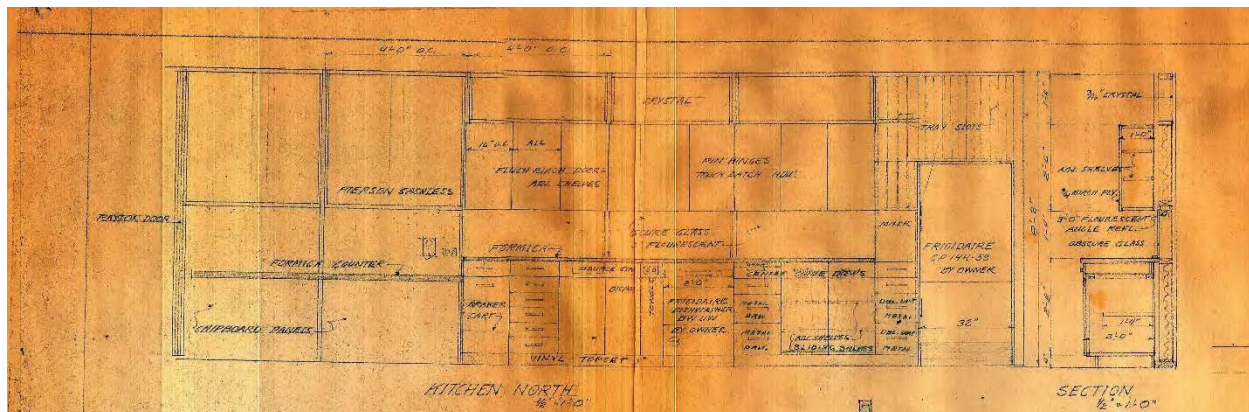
Original Blueprint depicting the first-floor galley kitchen design, complete with built in storage areas.³²
